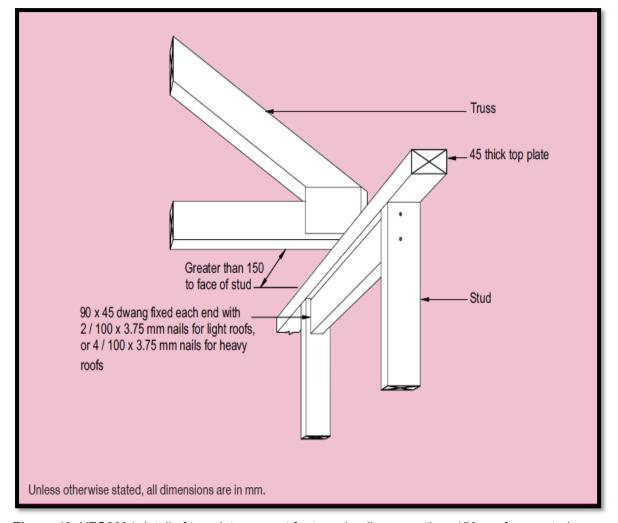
NZS3604 detail of top plate support for truss landing more than 150mm from a stud
